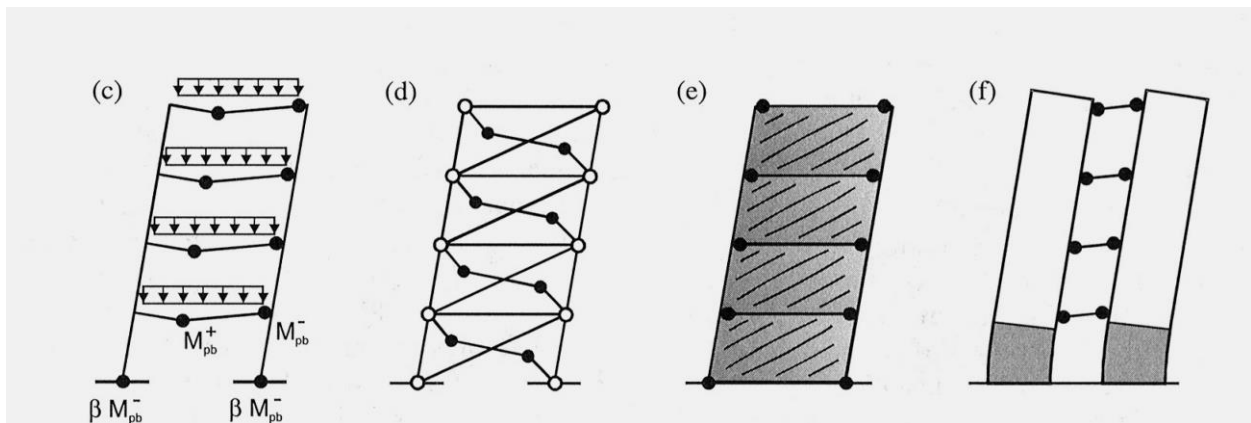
16 Collapse mechanism for some structural systems (Mitchell, 2003).
